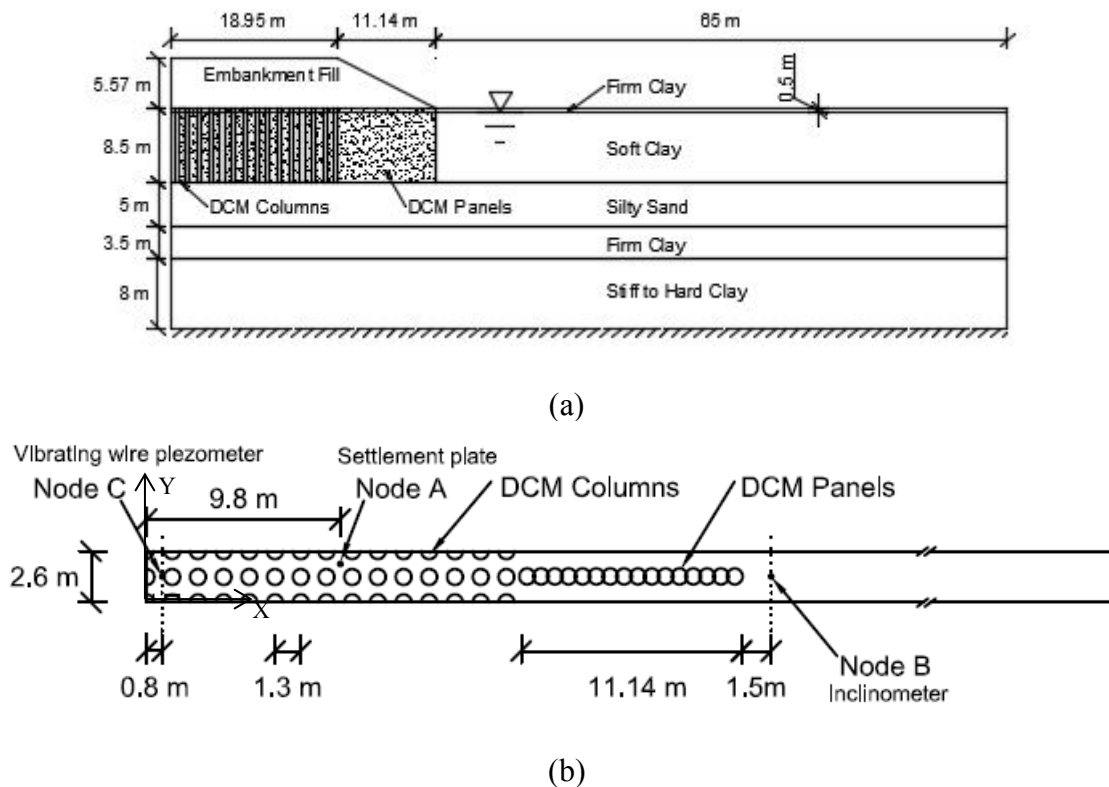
Geometry of the improved embankment and ground conditions (a) Section view (b) Plan view.
